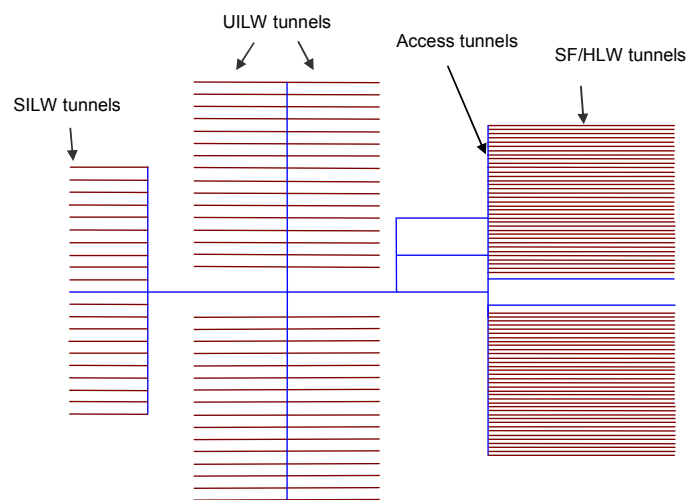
Schematic showing GDF layout for the weaker sedimentary rock example. ILW/LLW disposal tunnels are 300 m long and HLW/SF disposal tunnels are 780 m long and the separation between the two disposal modules is 500 m.
